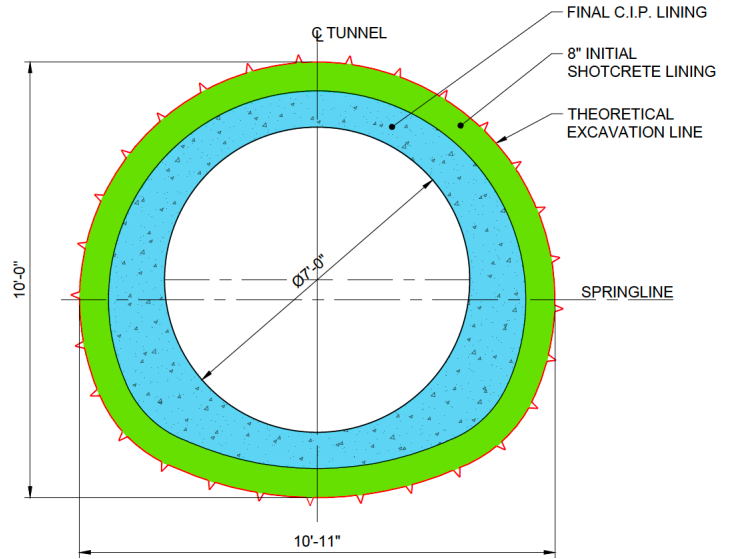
Fish Passage SEM Tunnel Schematic Cross Section.
